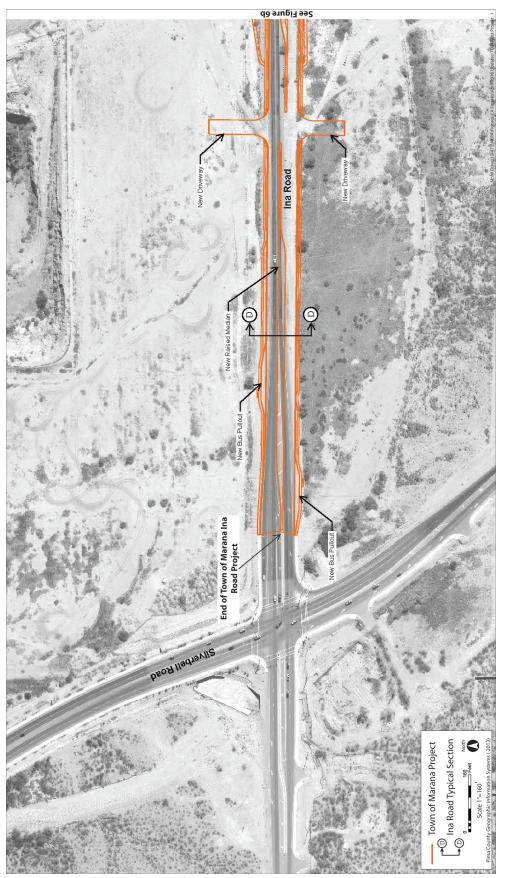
Town of Marana Ina Road project west of Santa Cruz River
